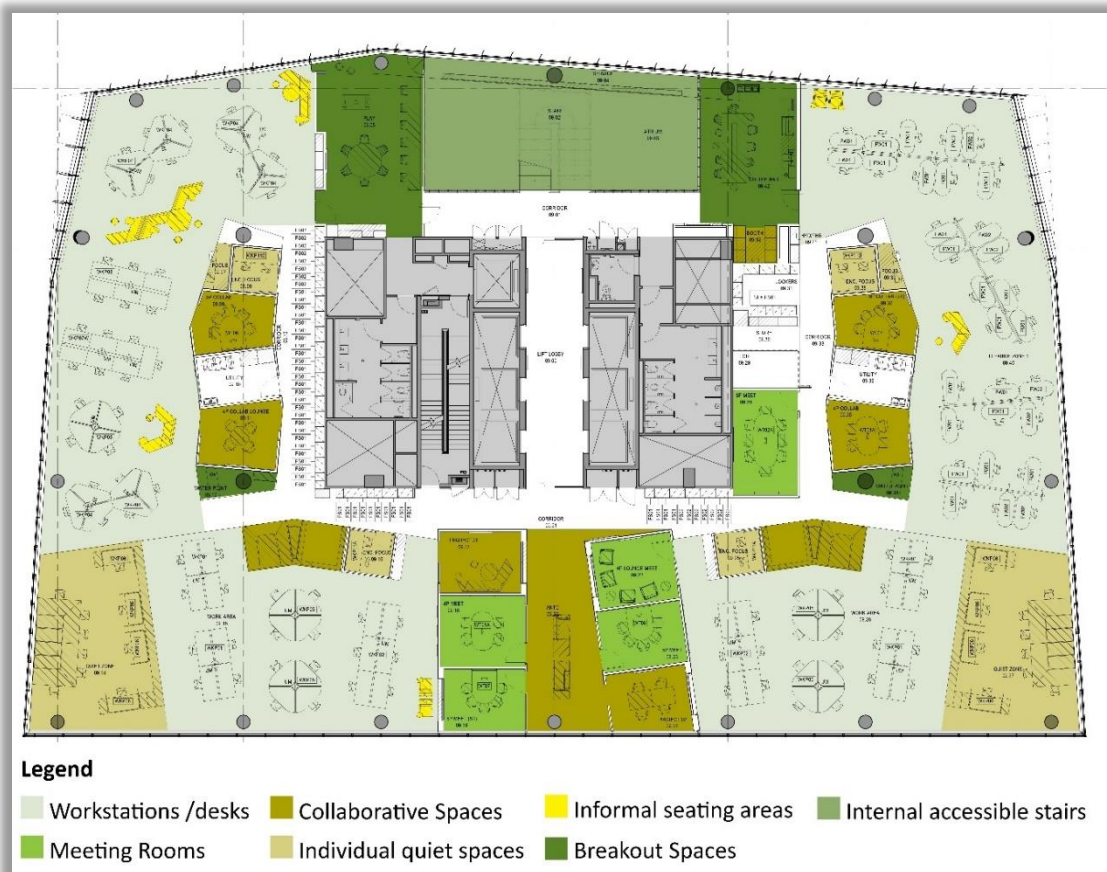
After-move Site C typical floorplan with six setting types and stairs
